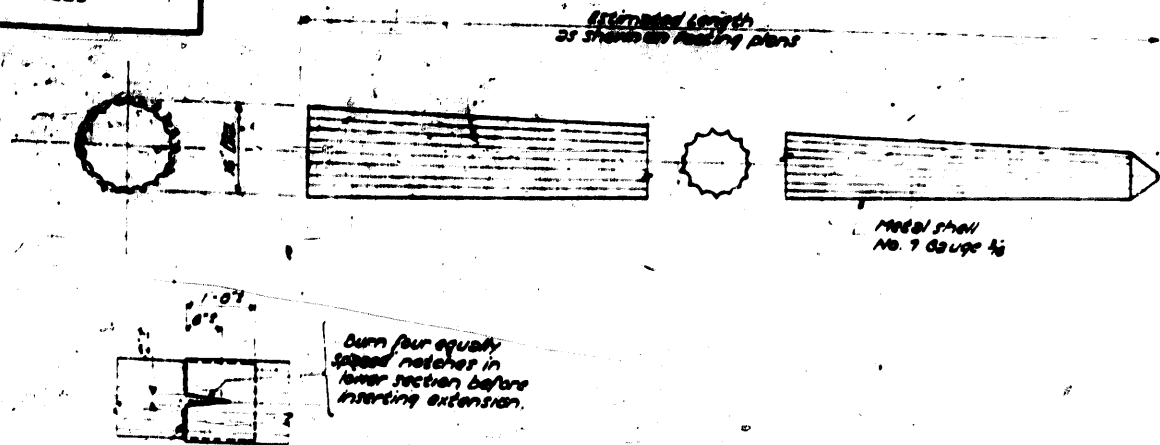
DETAIL OF SPIRALLY WELDED STEEL SHELL FOR CAST-IN-PLACE CONCRETE PILES
